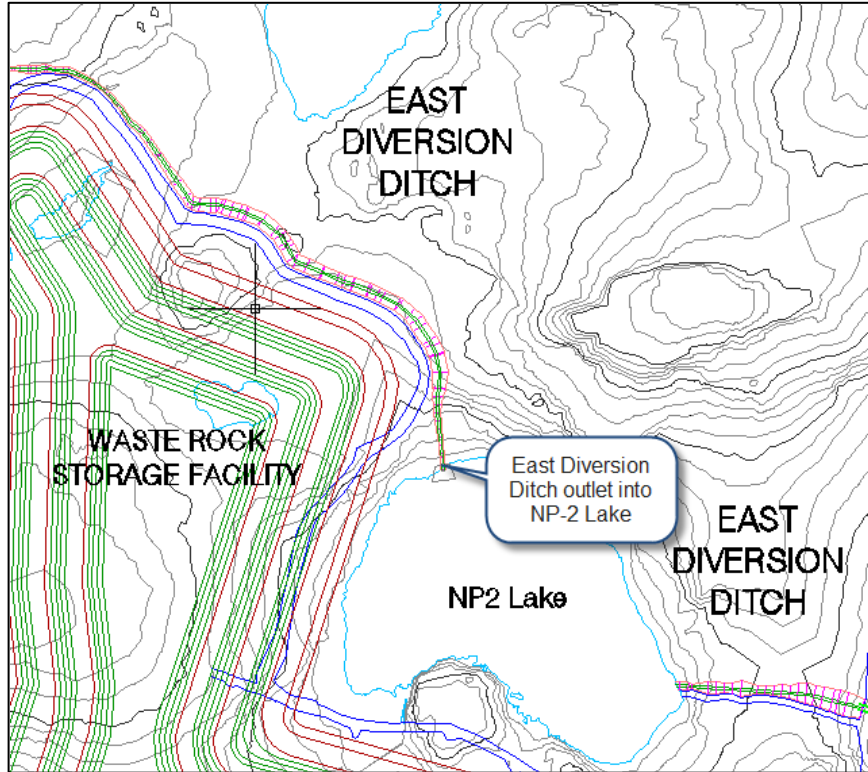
View of the East Diversion ditch outlet into NP-2 Lake
